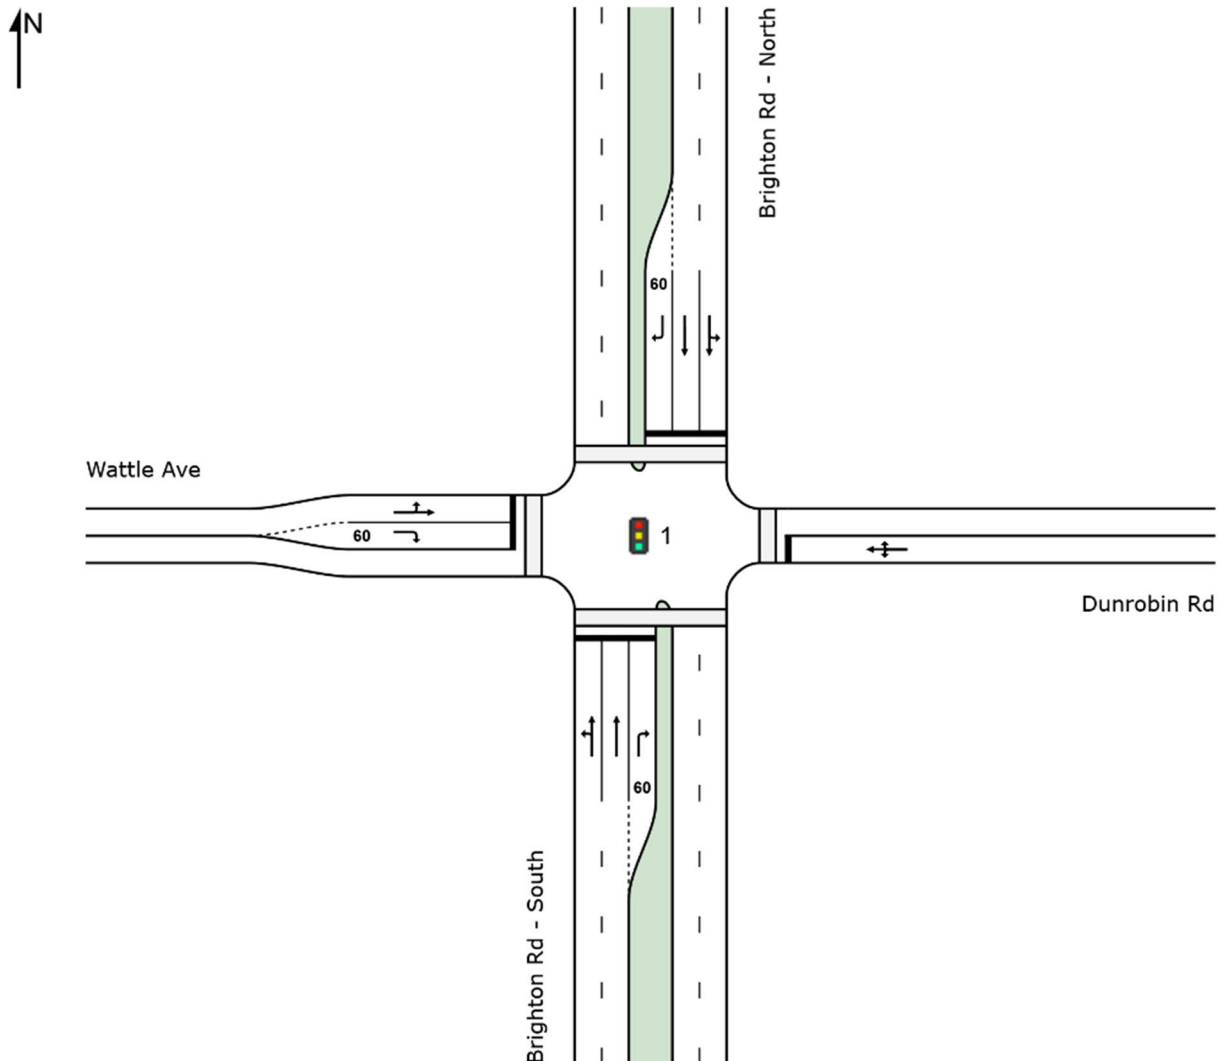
Brighton Road – Wattle Avenue SIDRA intersection layout
